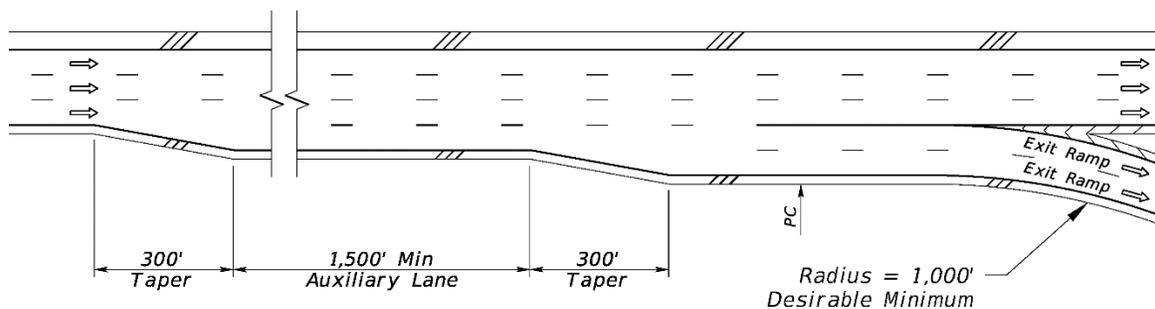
Parallel Design Type Exit Ramp Terminal
